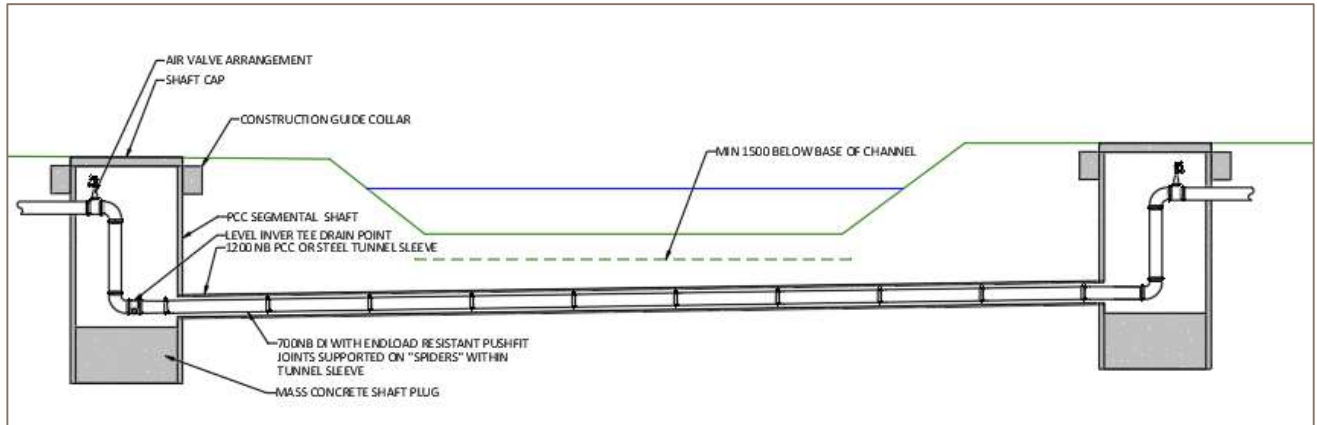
Typical Tunnel Arrangement Below Major Water Course
